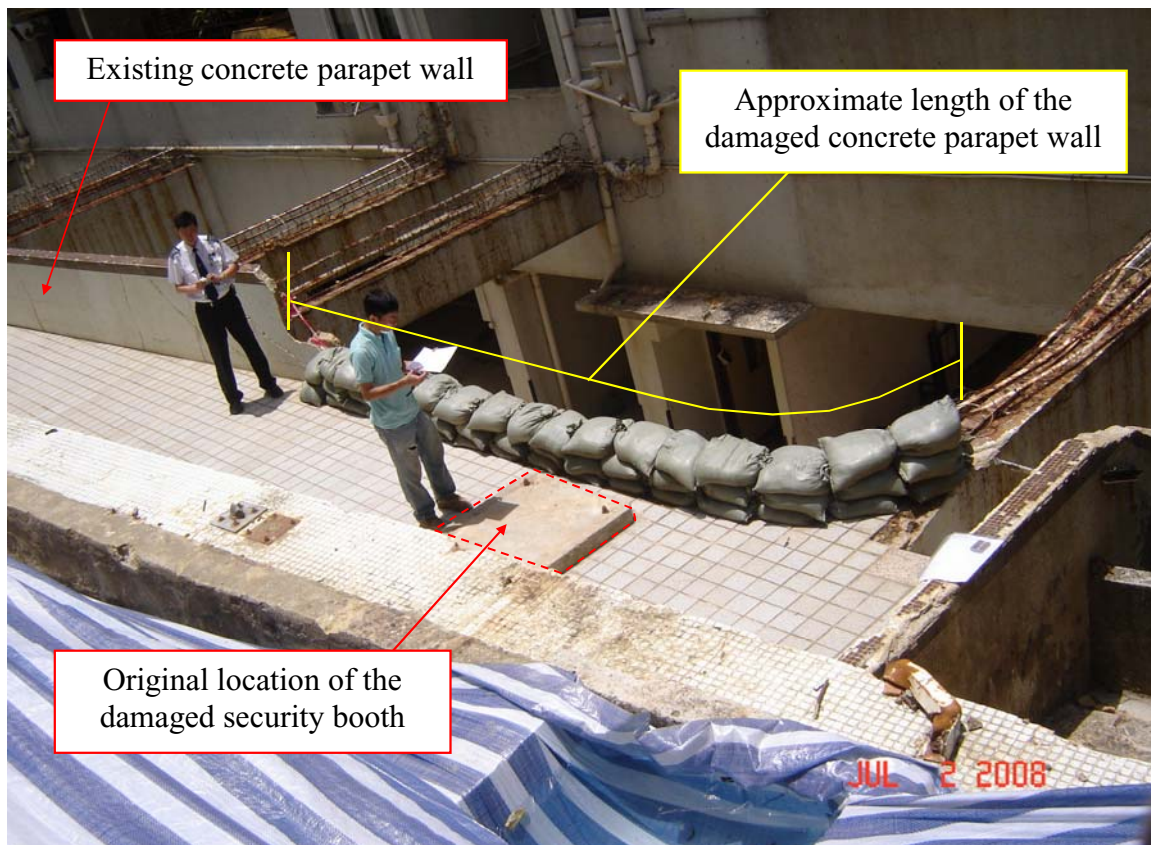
Damaged Security Booth and Concrete Parapet Wall at the Rear of Ewan Court
